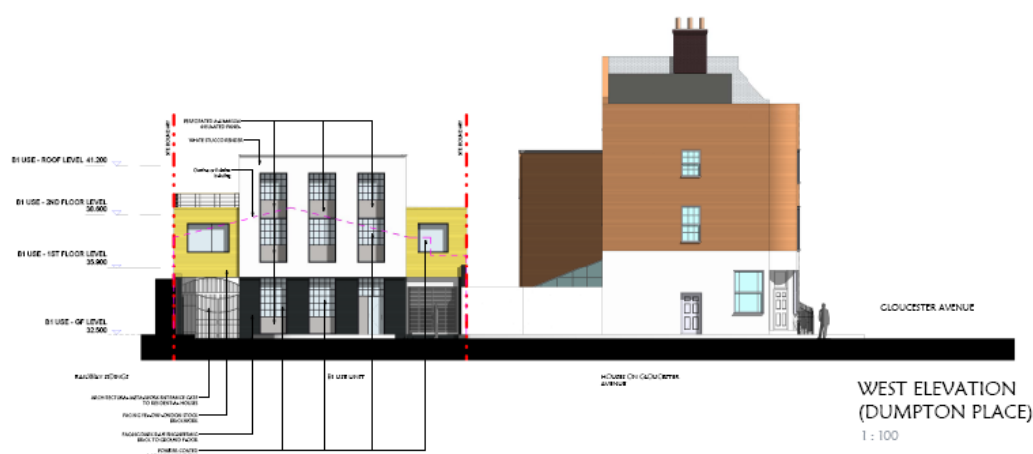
Scheme drawing showing the west elevation of the new office building in context with the property at 88 Gloucester Avenue. (PMA Architects)
